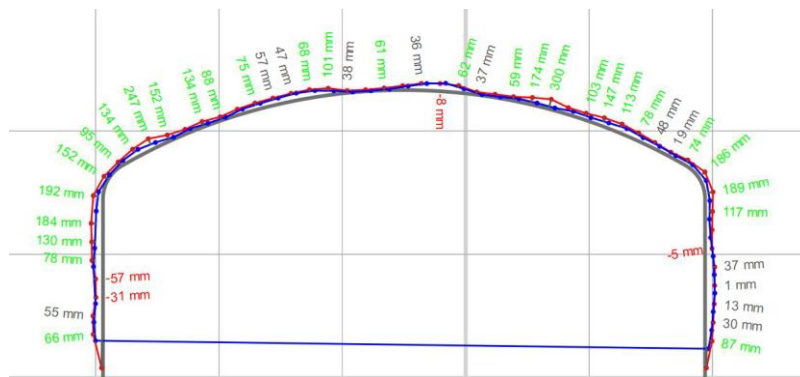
Checking of temporary shotcrete thickness and overbreak/underbreak
